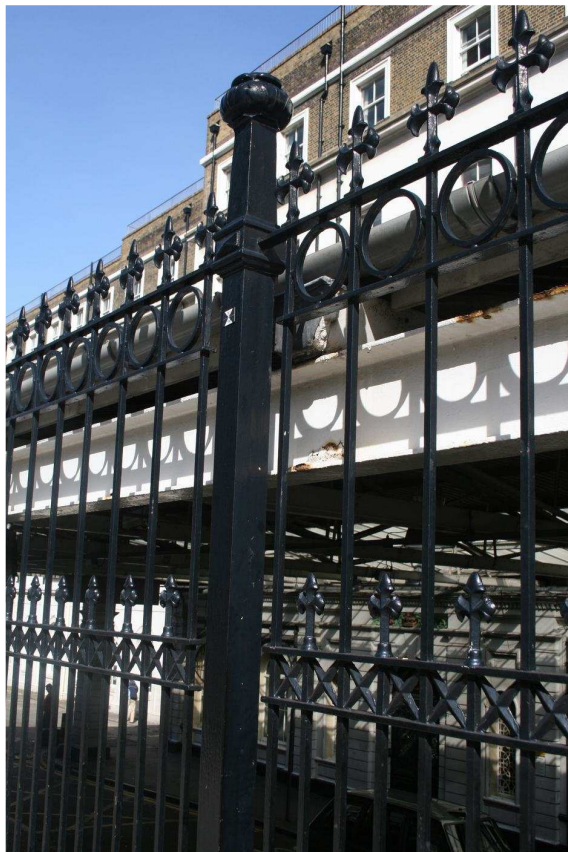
Western section railings, panel 42, balusters bolted to base
